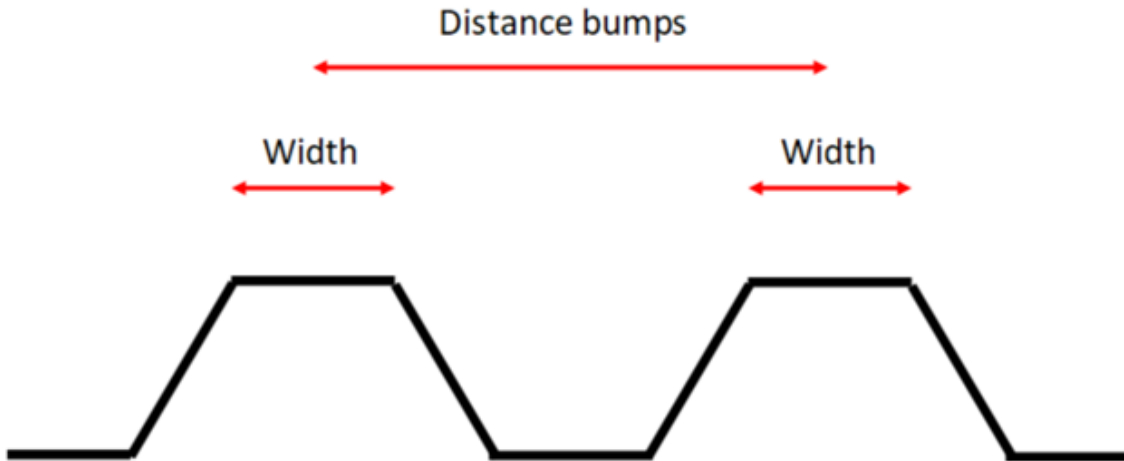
Sketch of cross section of a piling sheet and relevant parameters
